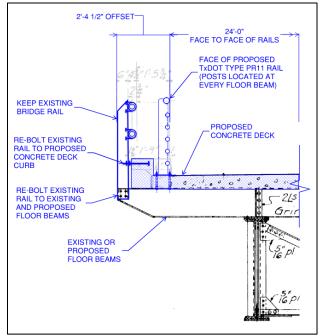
Alternative 4 Bridge Rail Rehabilitation Concept
